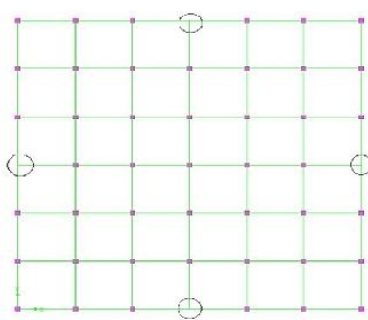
Columns removed in outer face of exterior frame (plan view)
